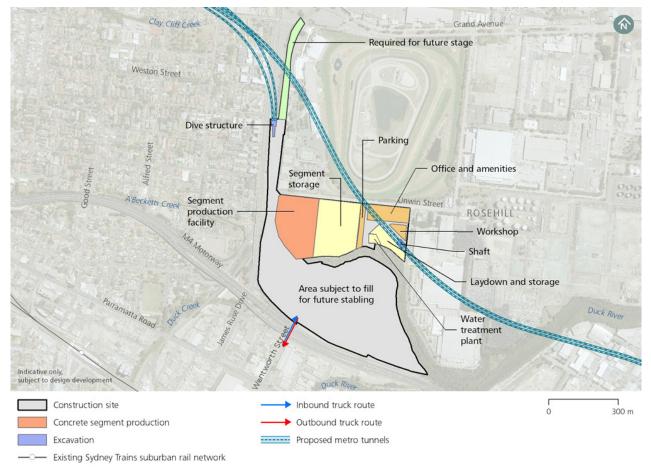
Clyde stabling and maintenance facility indicative construction site (approved project) (Sydney Metro, 2020a)
